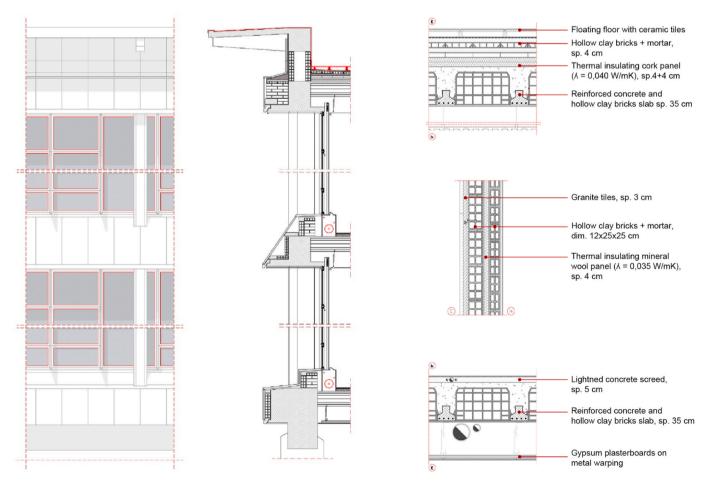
Actual state survey: façade, section and building layers on the west side; drawings G. Galbiati, F. Medici.
